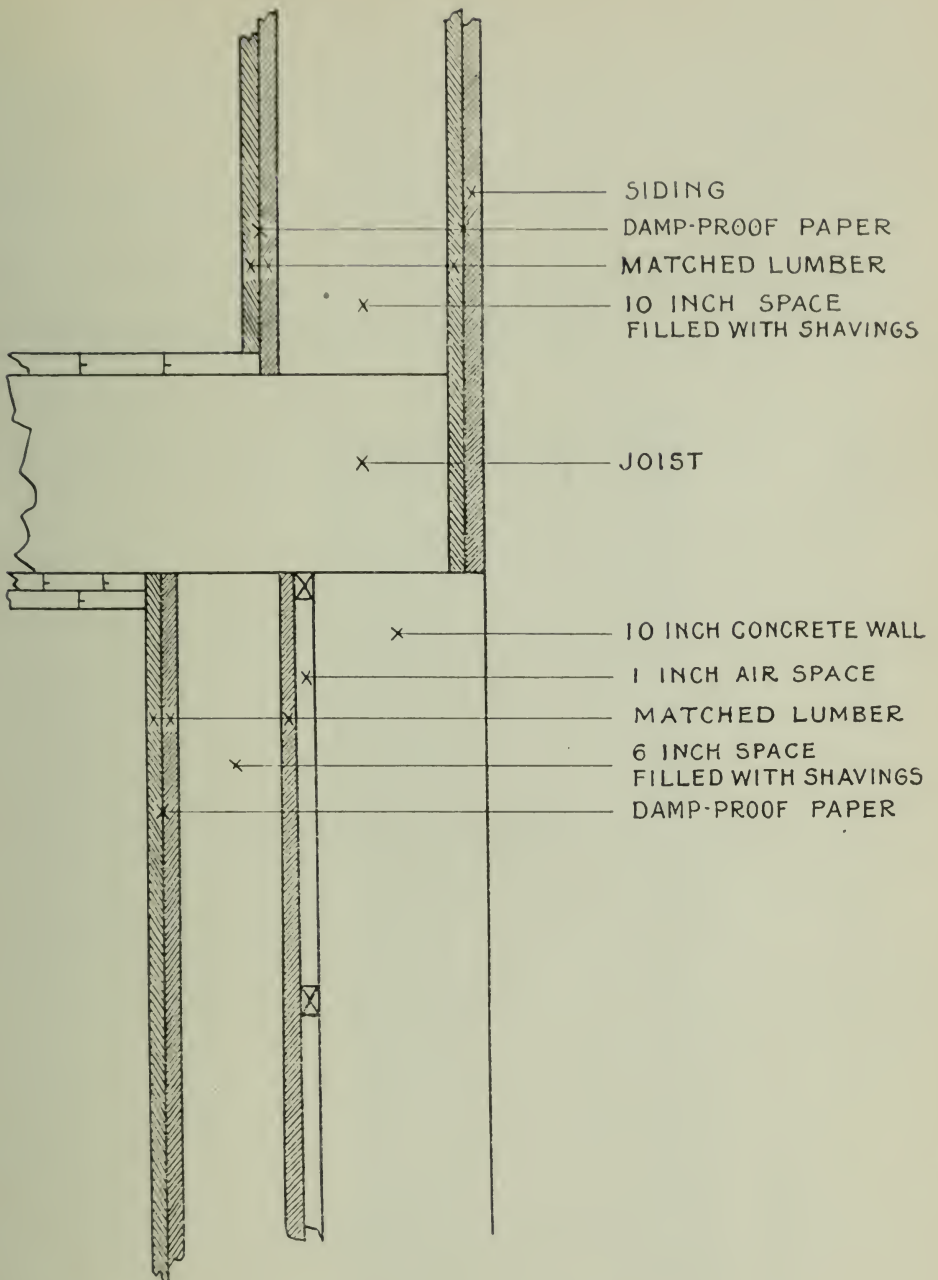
SECTION OF WALL AT CEILING OF BASEMENT.
